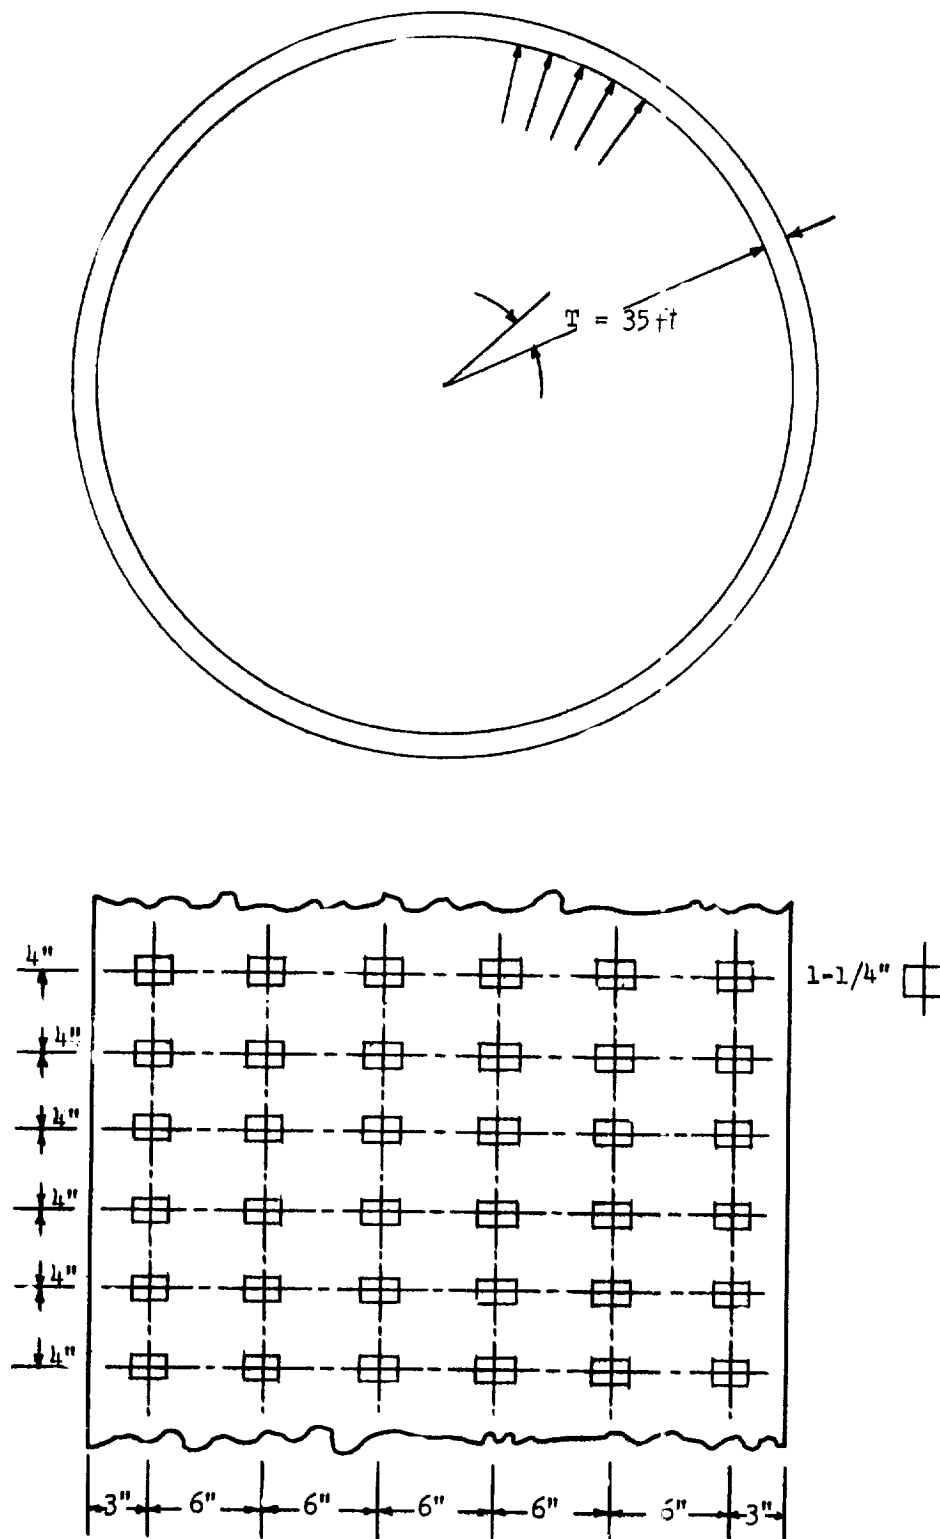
LONGITUDINAL SECTION THROUGH 70-FOOT WALL
